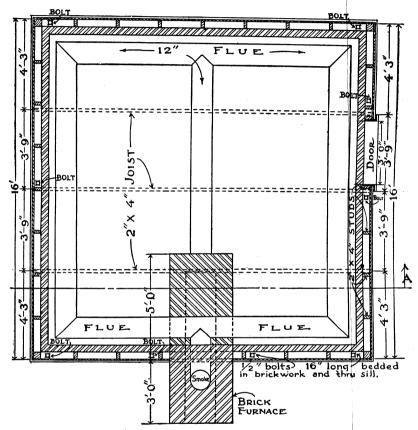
Ground-floor plan of a single-frame tobacco barn, showing arrangement of furnace and flues, also foundation and side walls
